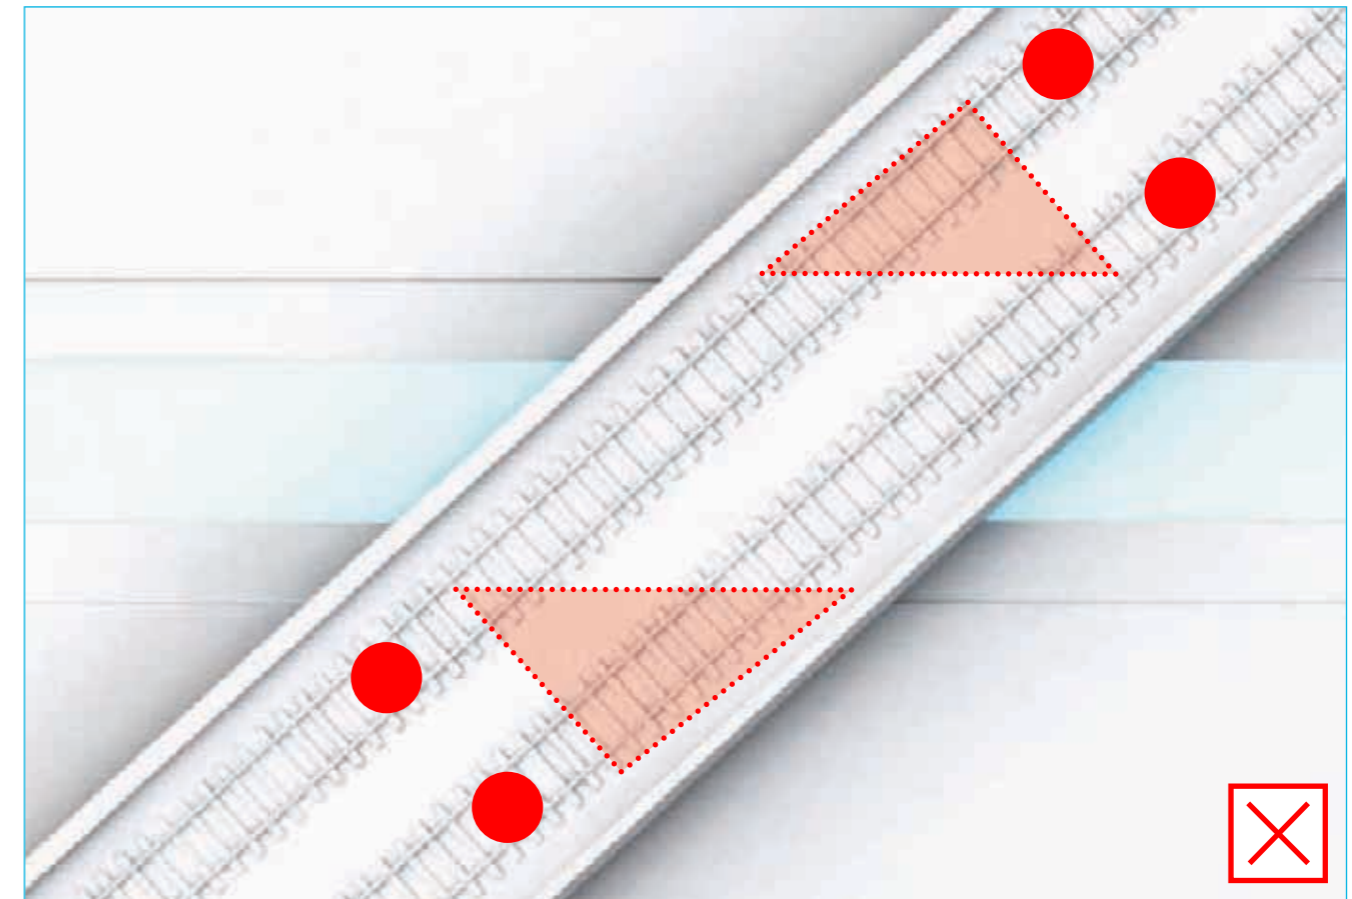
Piers aligned to the rail create 'dead' spaces for skewed crossings
